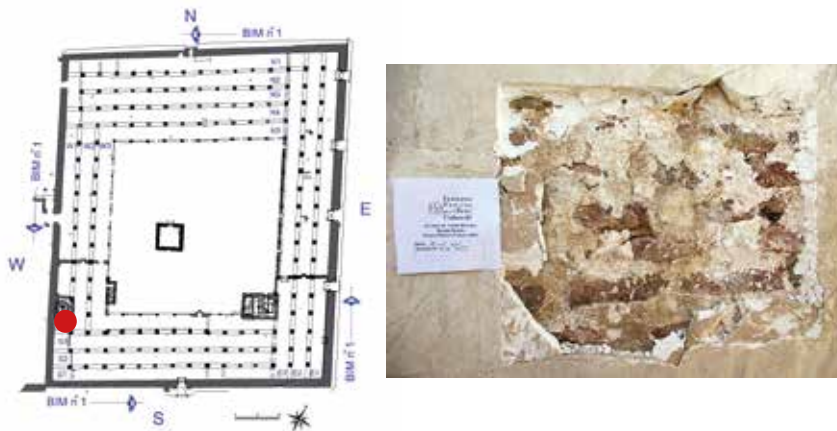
West minaret, east wall, sample no. MWEW0601.
